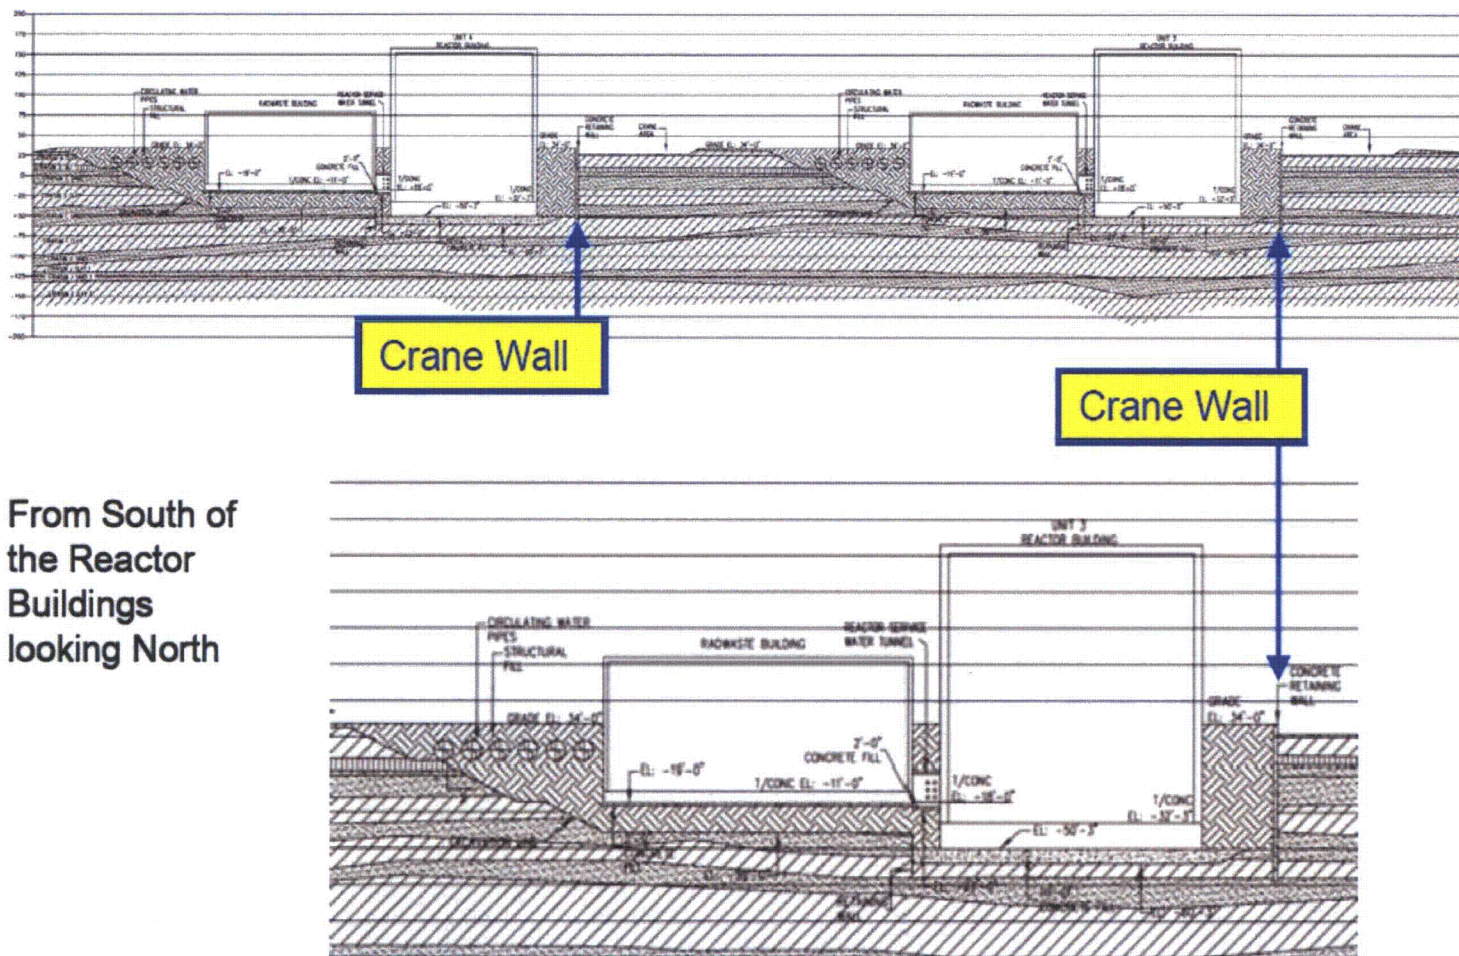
Overall Excavation Plan (From FSAR Figure 2.5S.4-48)
